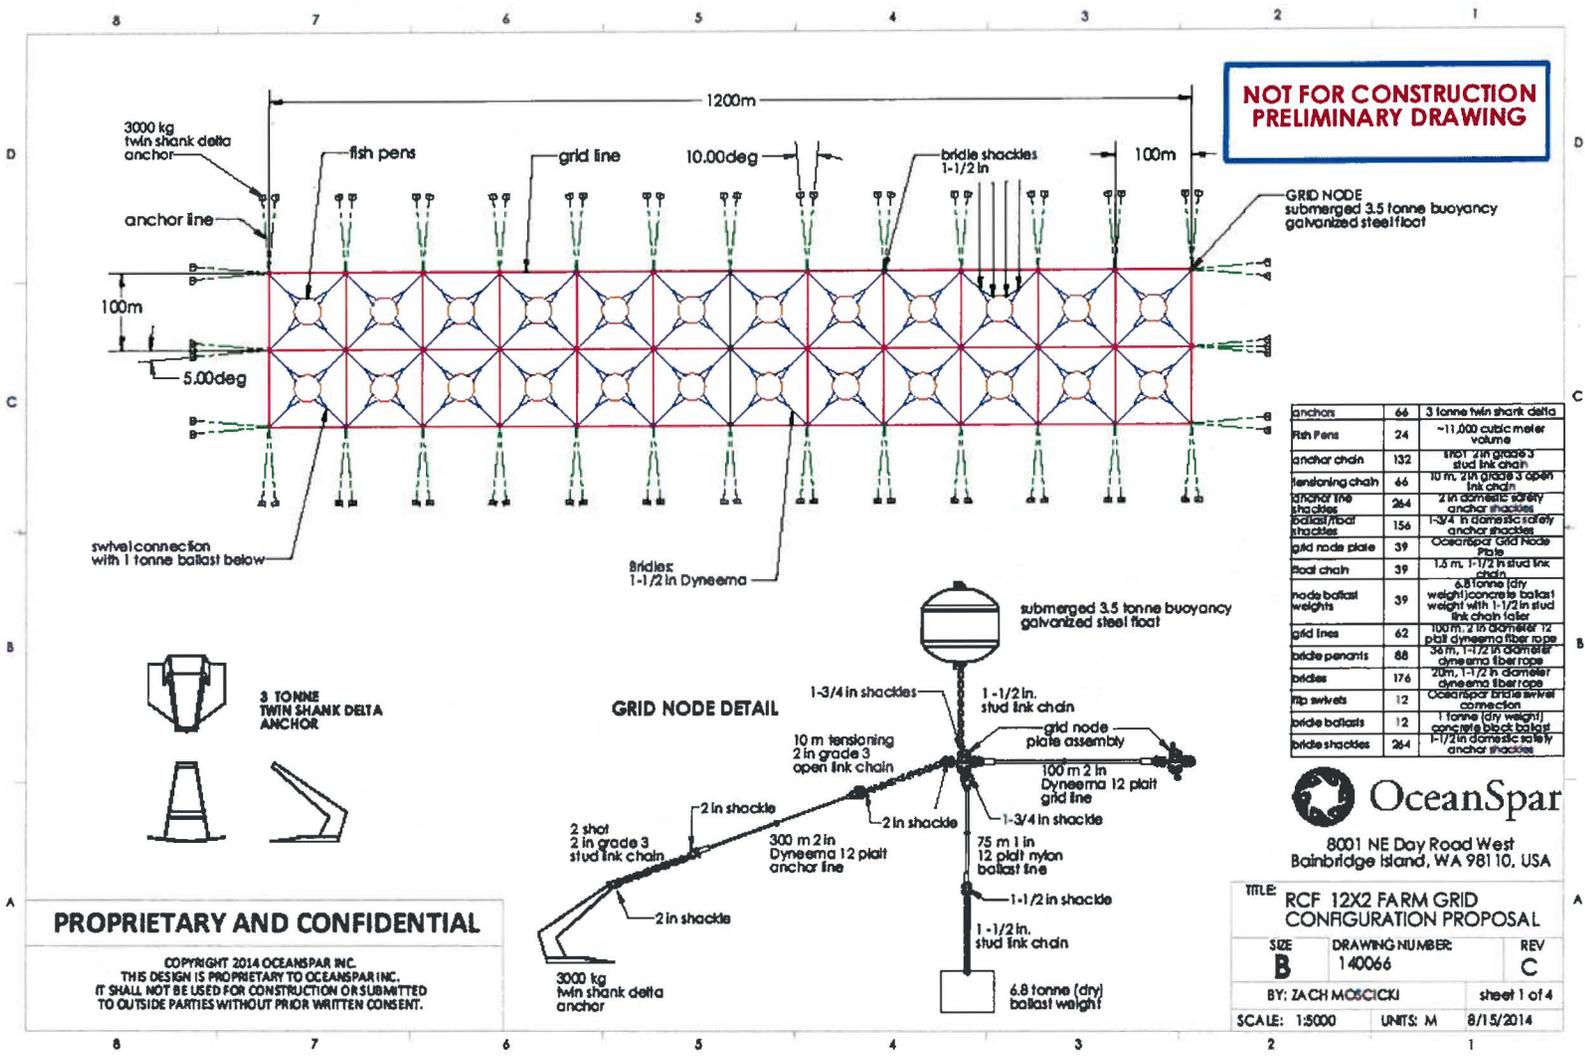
Plan and elevation view drawings of cage grid and mooring system components
